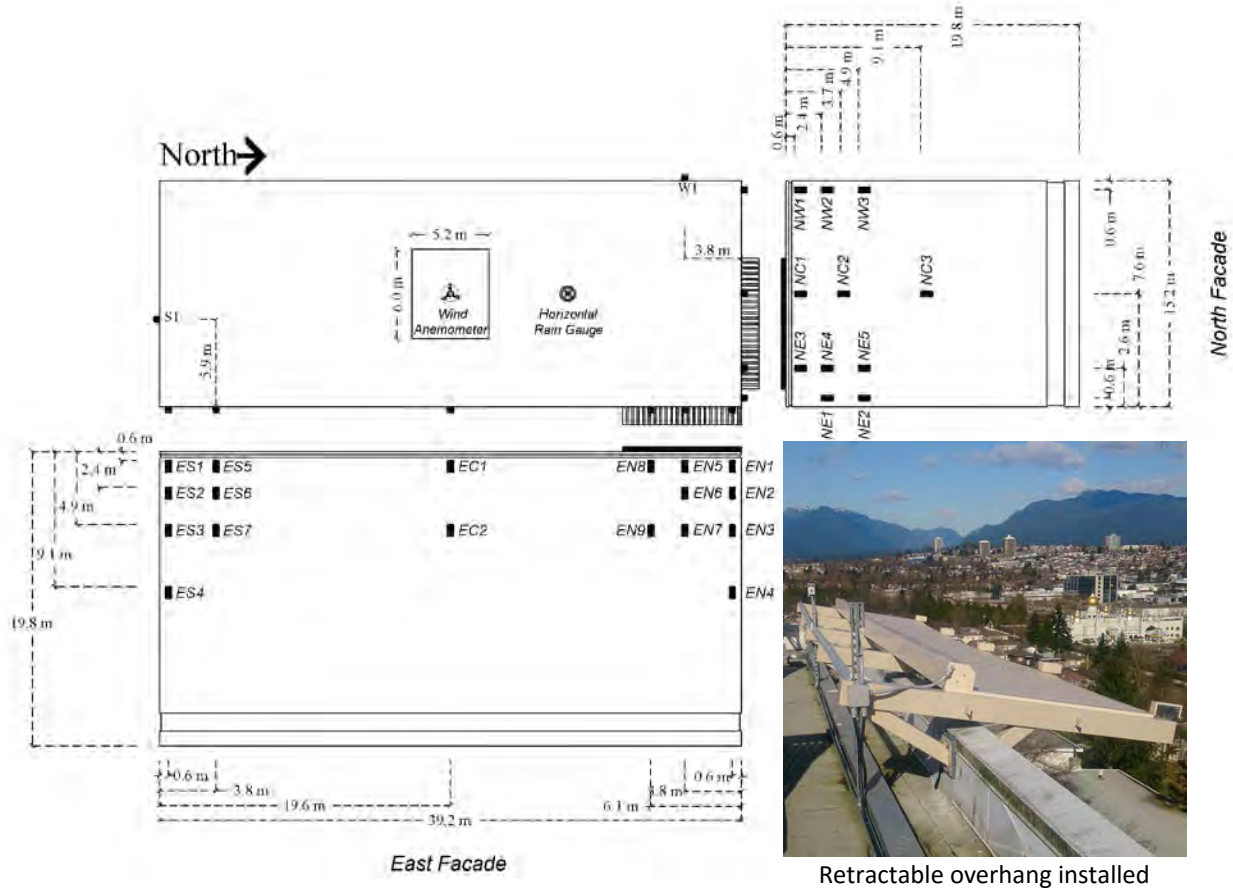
Location of on-site weather station and WDR gauges installed on the east and north facades.
